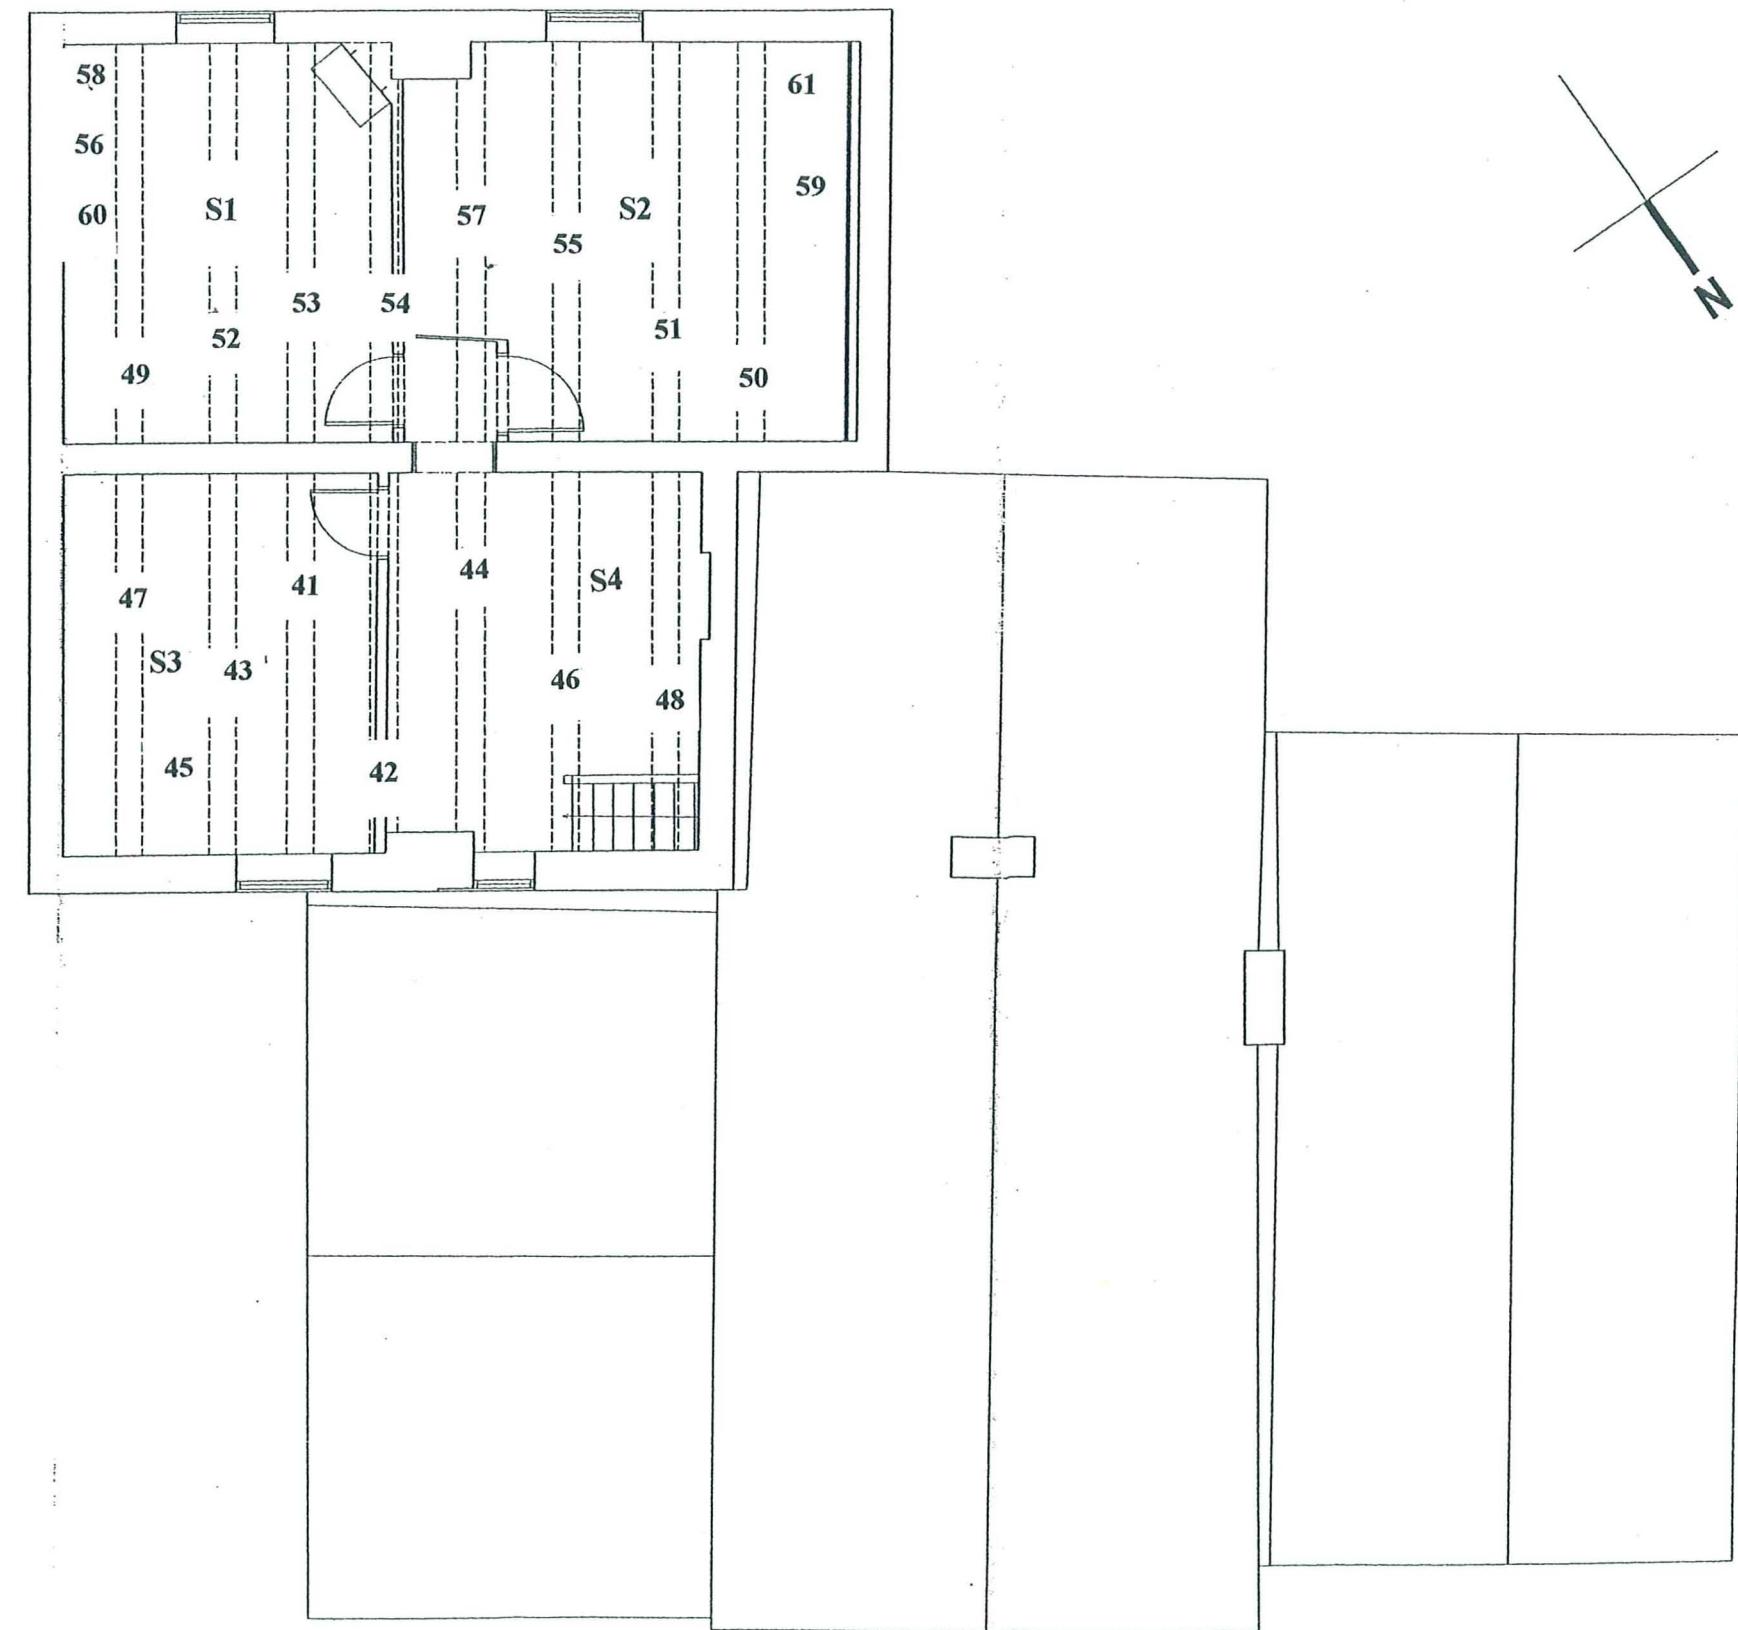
Plan to show approximate location of sampled timbers based on a second-floor plan
